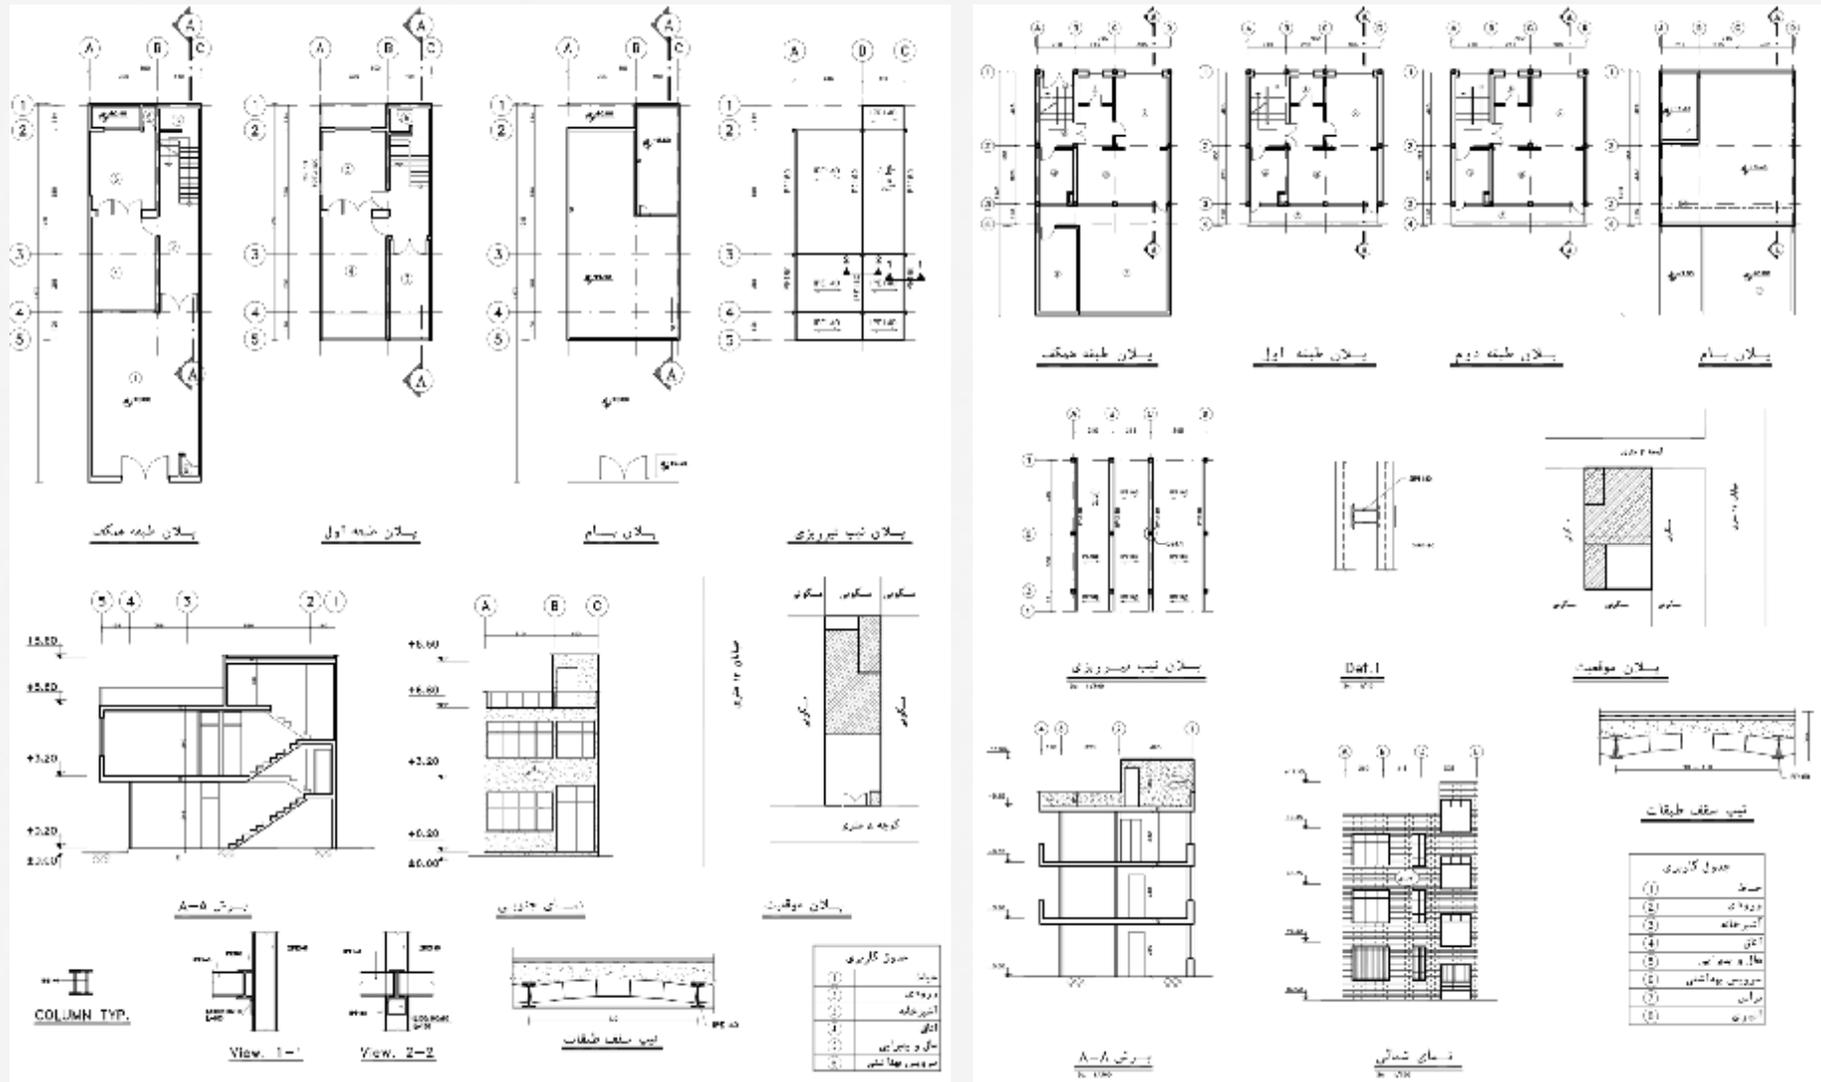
Type 1 and 2 of STEEL STRUCTURE BUILDINGS
